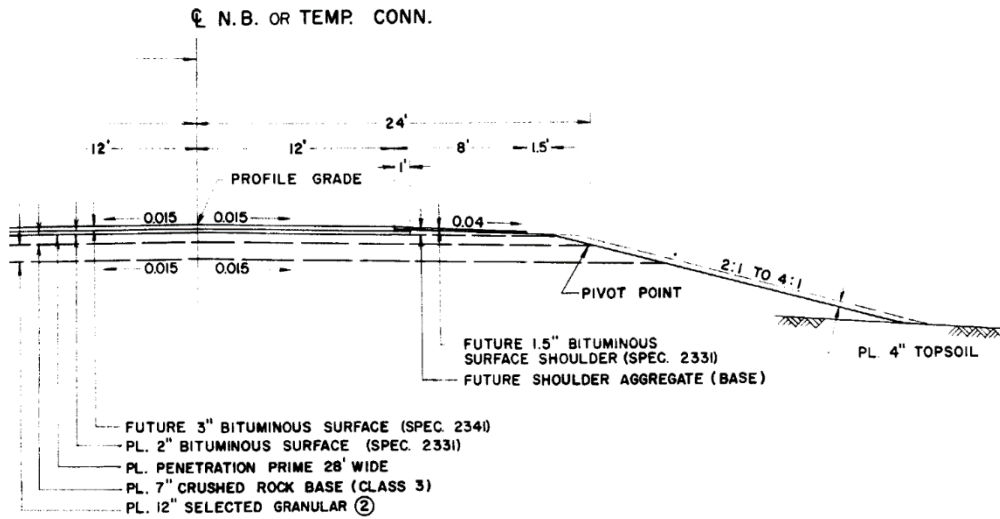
TH 61 mainline typical section (1966 construction plan)
